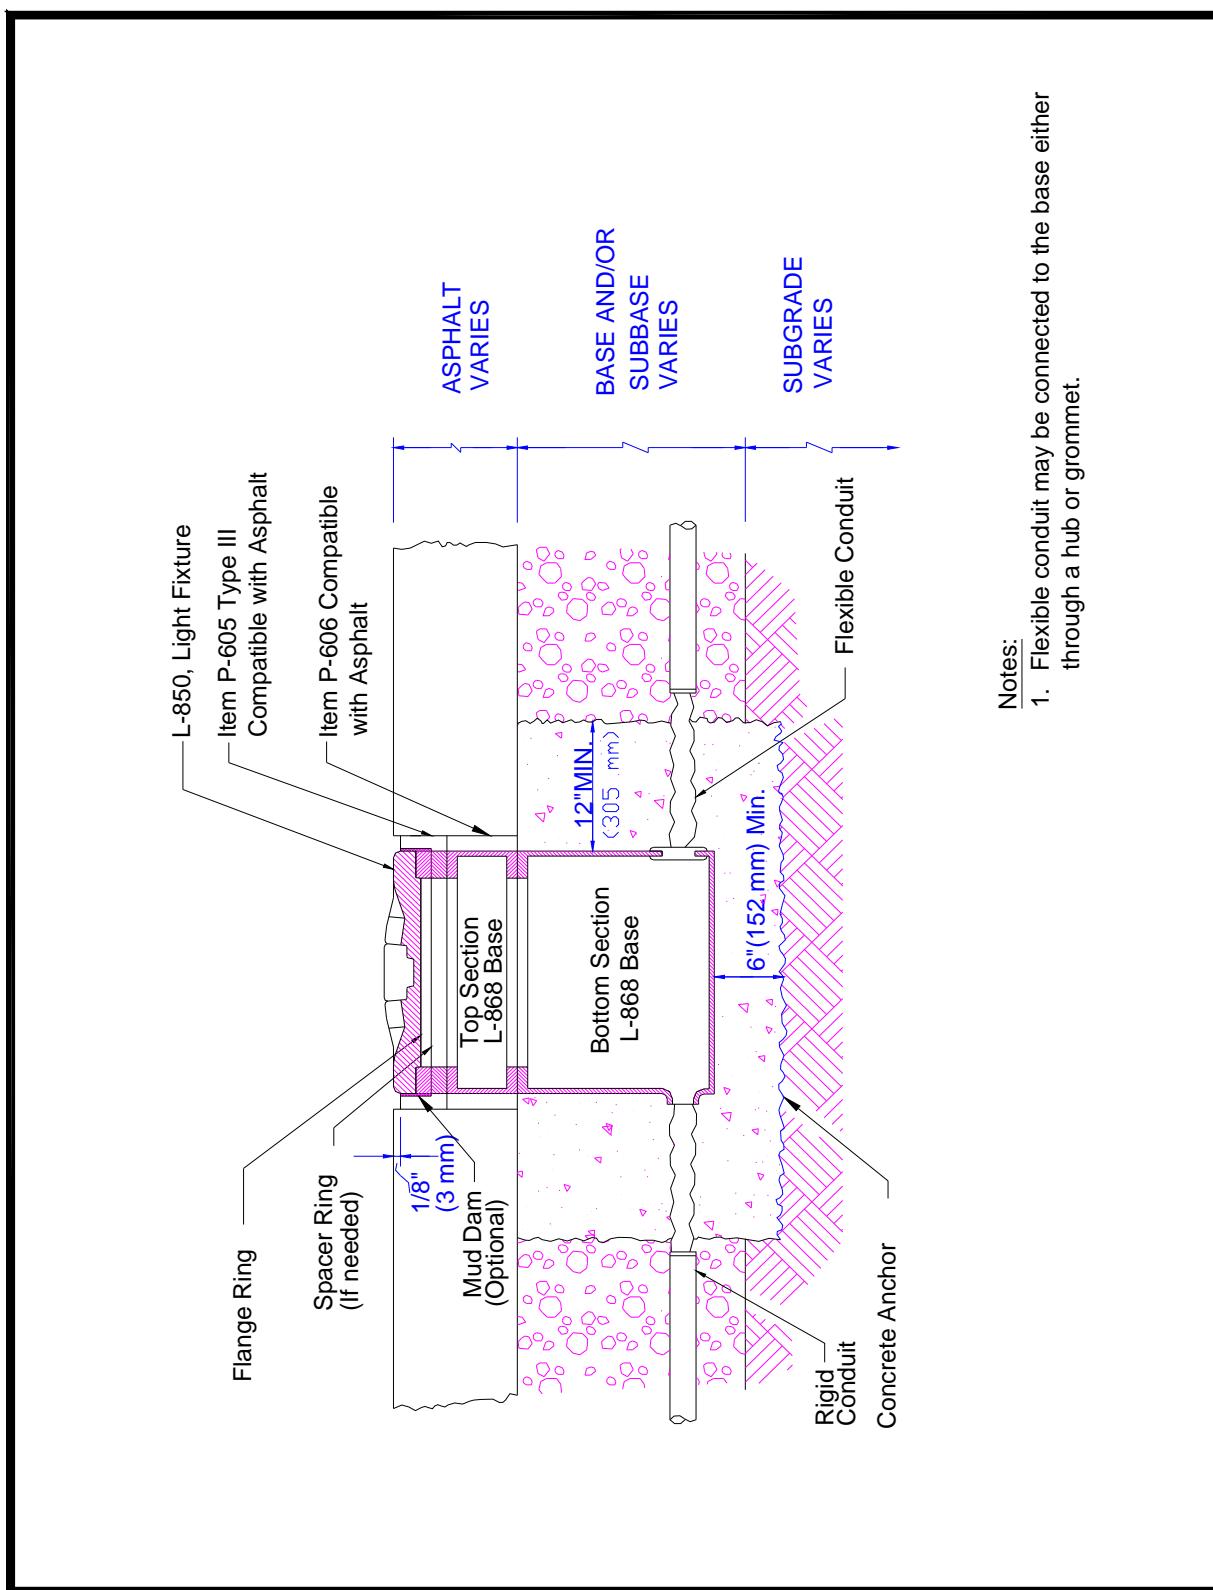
Section Through Non-adjustable Base and Anchor, Base and Conduit System, Flexible Pavement.
